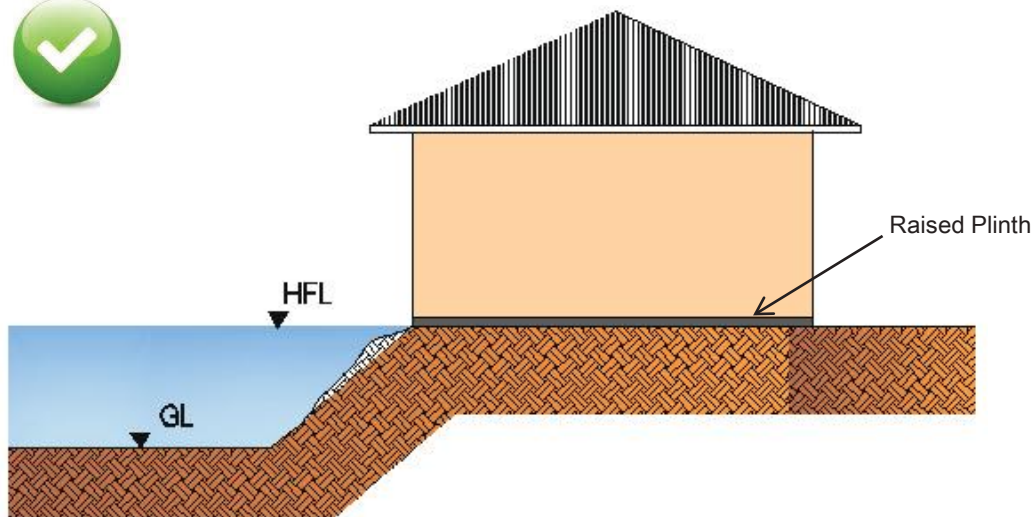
Plinth Level Raised By Building On Higher Ground
